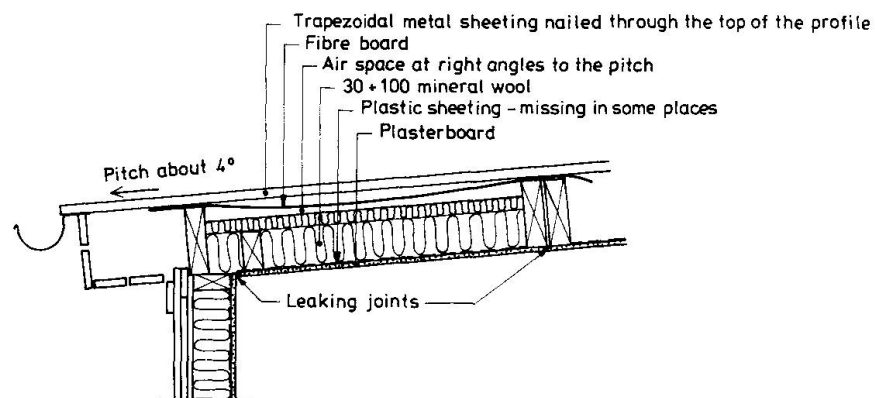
The roof construction consists of prefabricated elements. Owing to leaks at the joints the inside air was able to leak into the construction, where it condensed against the metal sheeting. Outside moisture was also able to penetrate the roof. Owing to swelling from damp the fibre boarding hung down blocking the vented air space.
